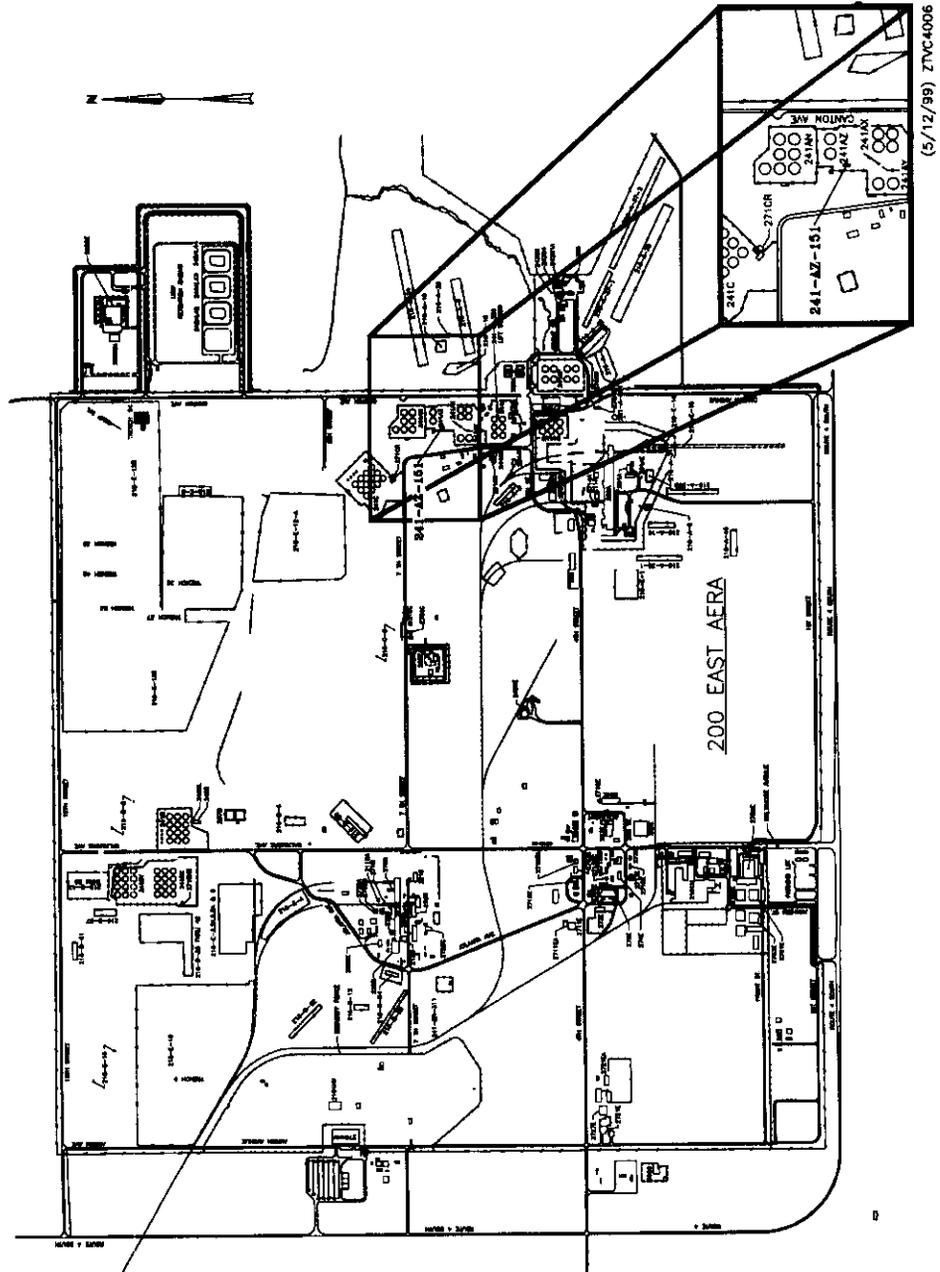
SITE PLAN – 241-AZ-151 Catch Tank.
